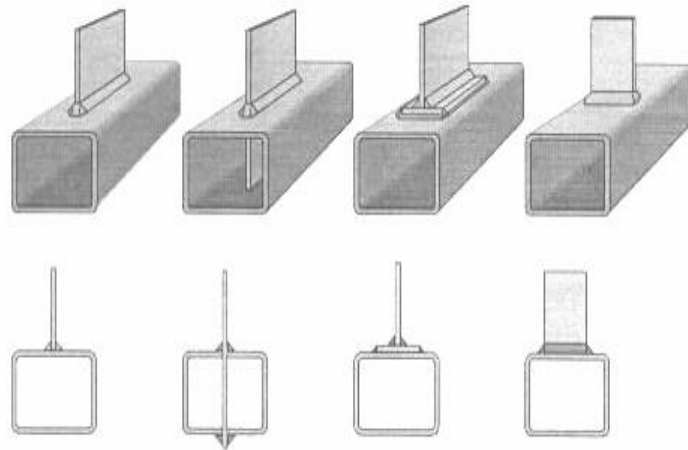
Typical Simple (No-Moment) and Rigid Joint Details (Neves et al. 2002)
